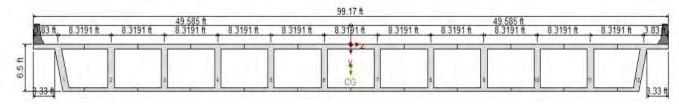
Bridges on SB and NB SR303L Frontage Road - Typical Section
